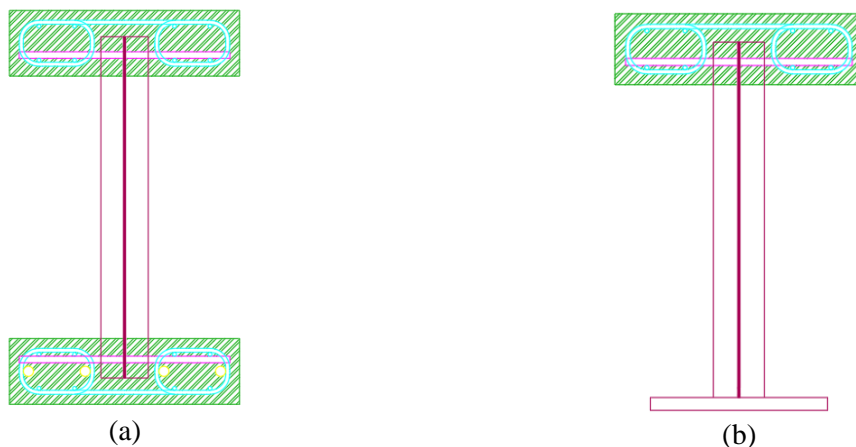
General cross-section of examined specimen: (a) 'hybrid' girder type, (b) 'composite' girder type
